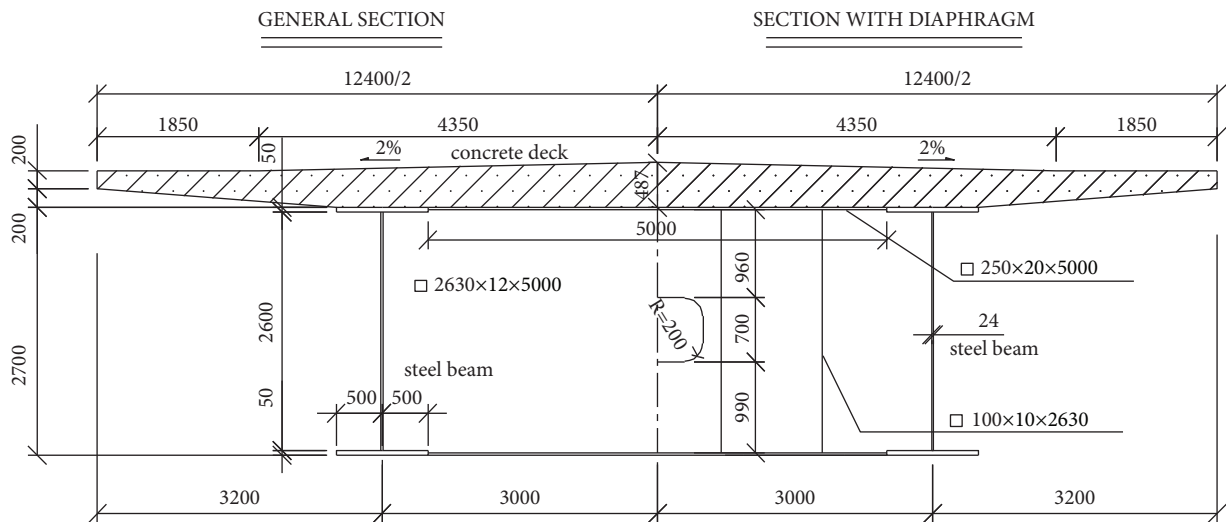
Cross-section of the SC composite beam (unit: mm).
